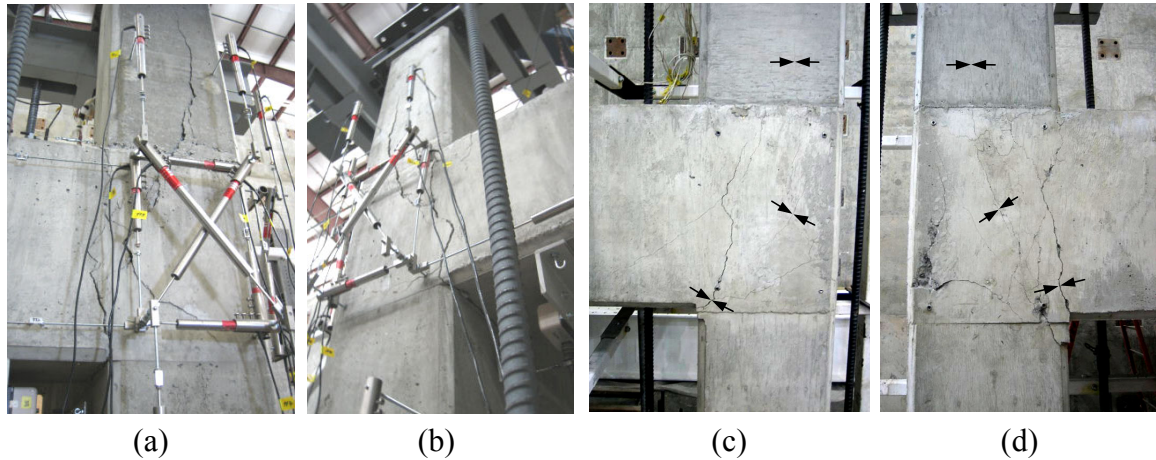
Damage modes before retrofit: (a, b) Specimen 1, and (c, d) Specimen 2.
